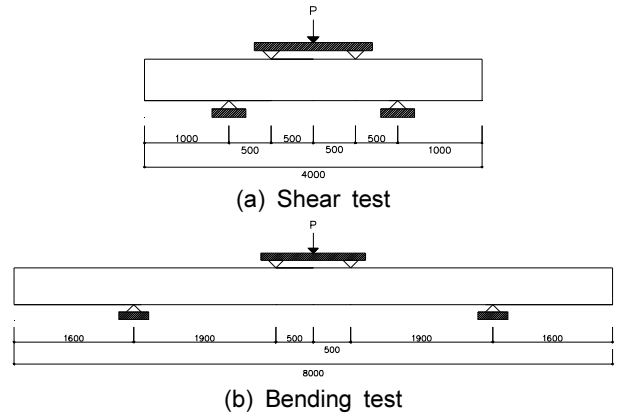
Third-point loading method⁸⁾ (unit: mm)
